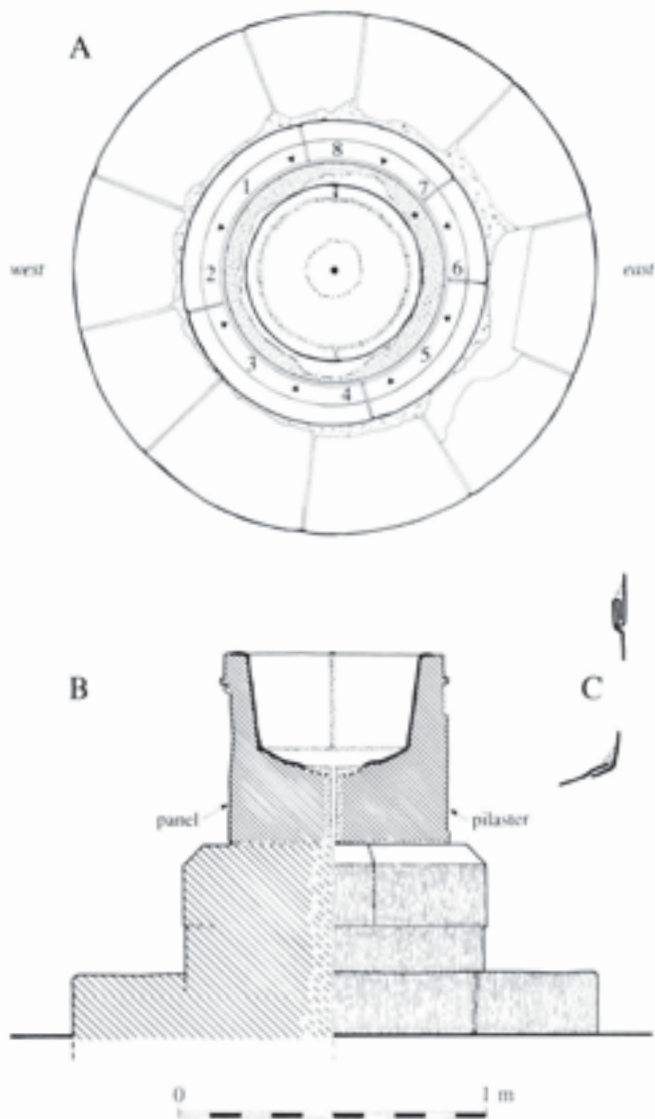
The font. A Plan. Arrows indicate the bay divisions on the bowl; the arcade bays are numbered 1-8. B Section, with the plinth and step shown partly in elevation. C Details of the welt and lap-joints in the lead lining (not to scale). Scale 1:25
